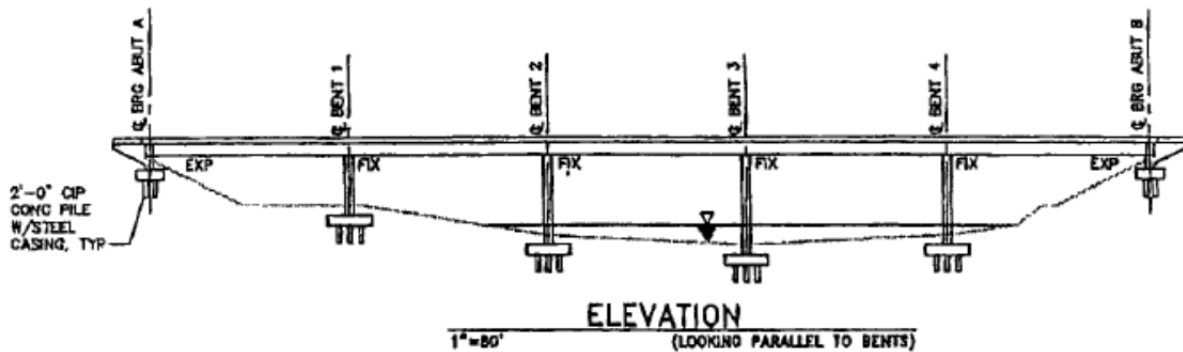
Origin of bridge model (NCHRP Project 12-49)
